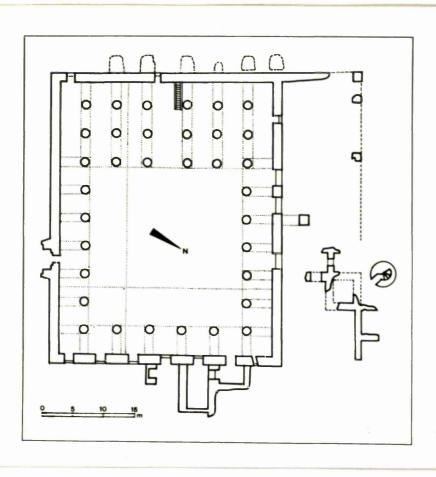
Tarik Khana, Damghan, Ground Plan.
